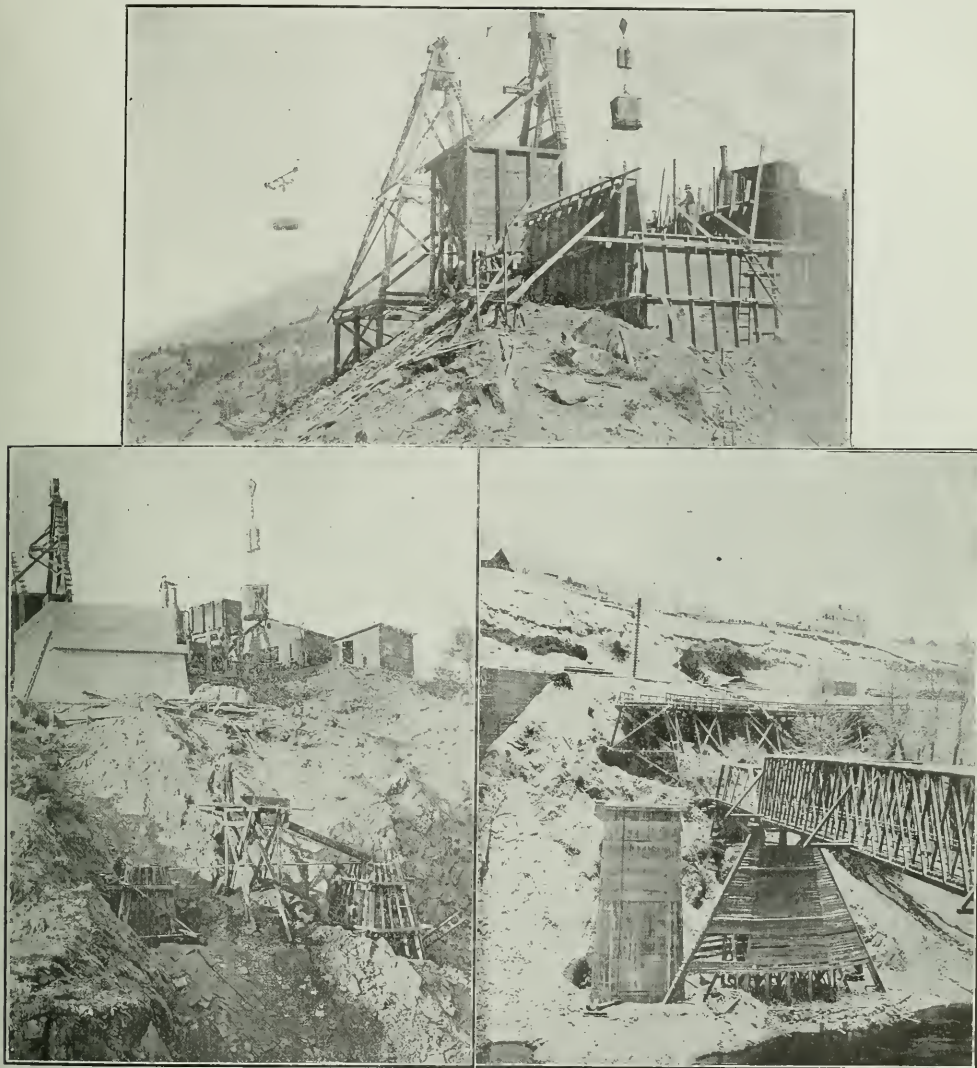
North Abutment in Place, Cableway and Bucket. North Abutment Completed and Pedestals of Steel Bent. South Pier and Timber Trestle Approach.
